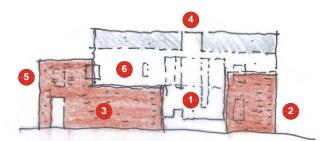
Nimrod Street. New theatre building including new passenger lift (1), access stairs (2) fire egress stairs (3), smoke exhaust (4), air conditioning plant (5) and Stables narrative (6). Source: TZG Architects, 2022.
